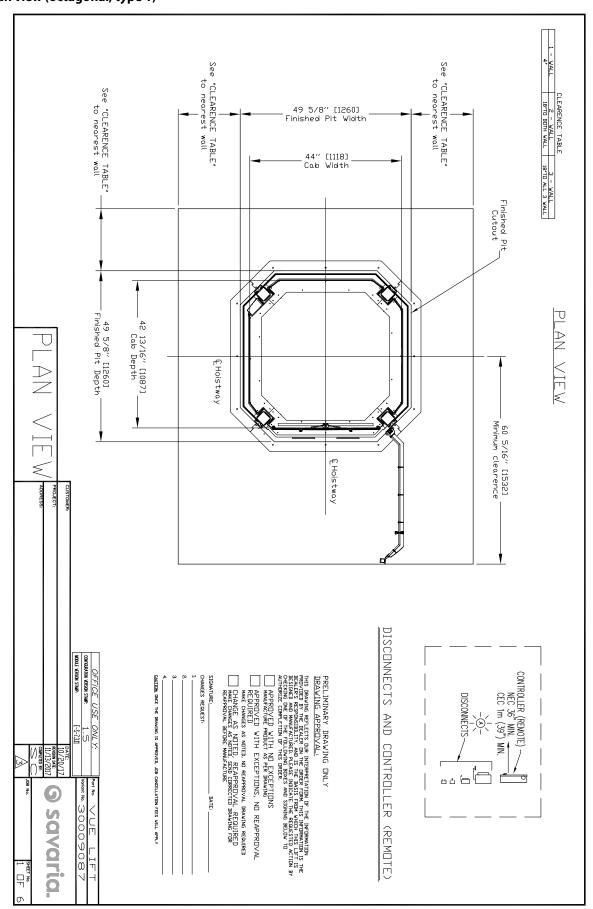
Pit/bottom floor/thru-floor view (octagonal, type 1)
